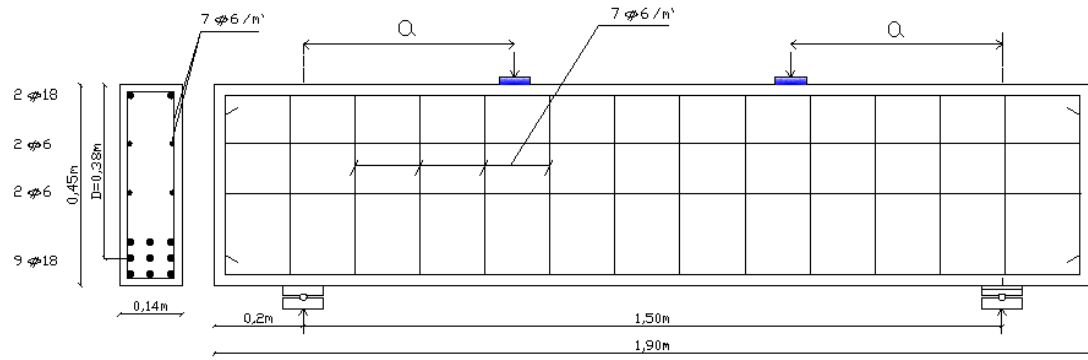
Concrete dimensions and details of reinforcement of a beam specimen
